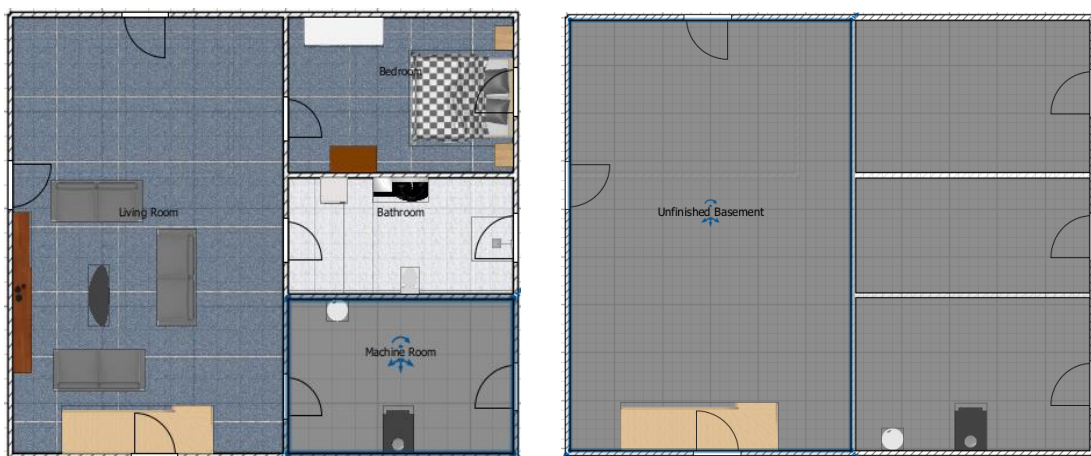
Floor plans of a finished basement (left) and unfinished basement (right) for one or two-storey single-family detached houses
